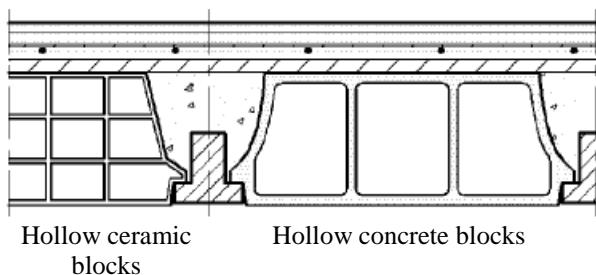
Structural solution for a floor slab with “independent” concrete footing
